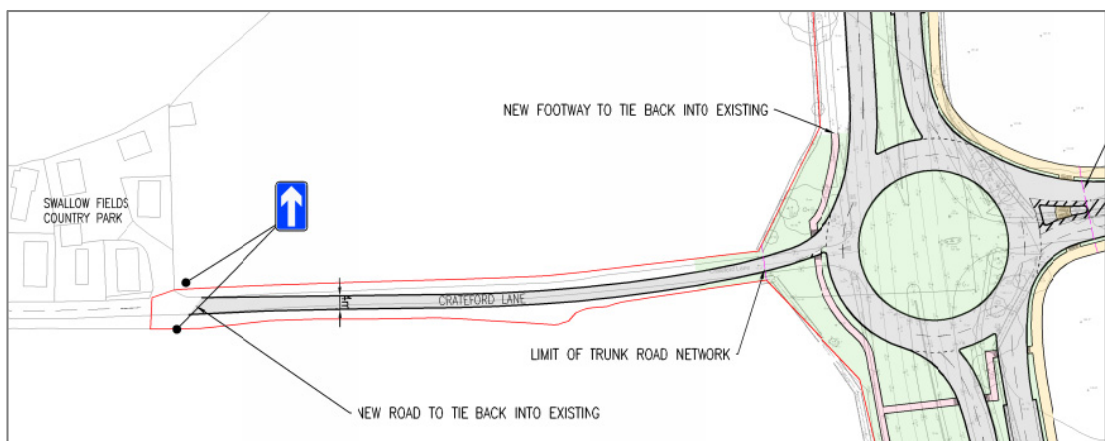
General Arrangement Plan 103 [Document 2.9C]
